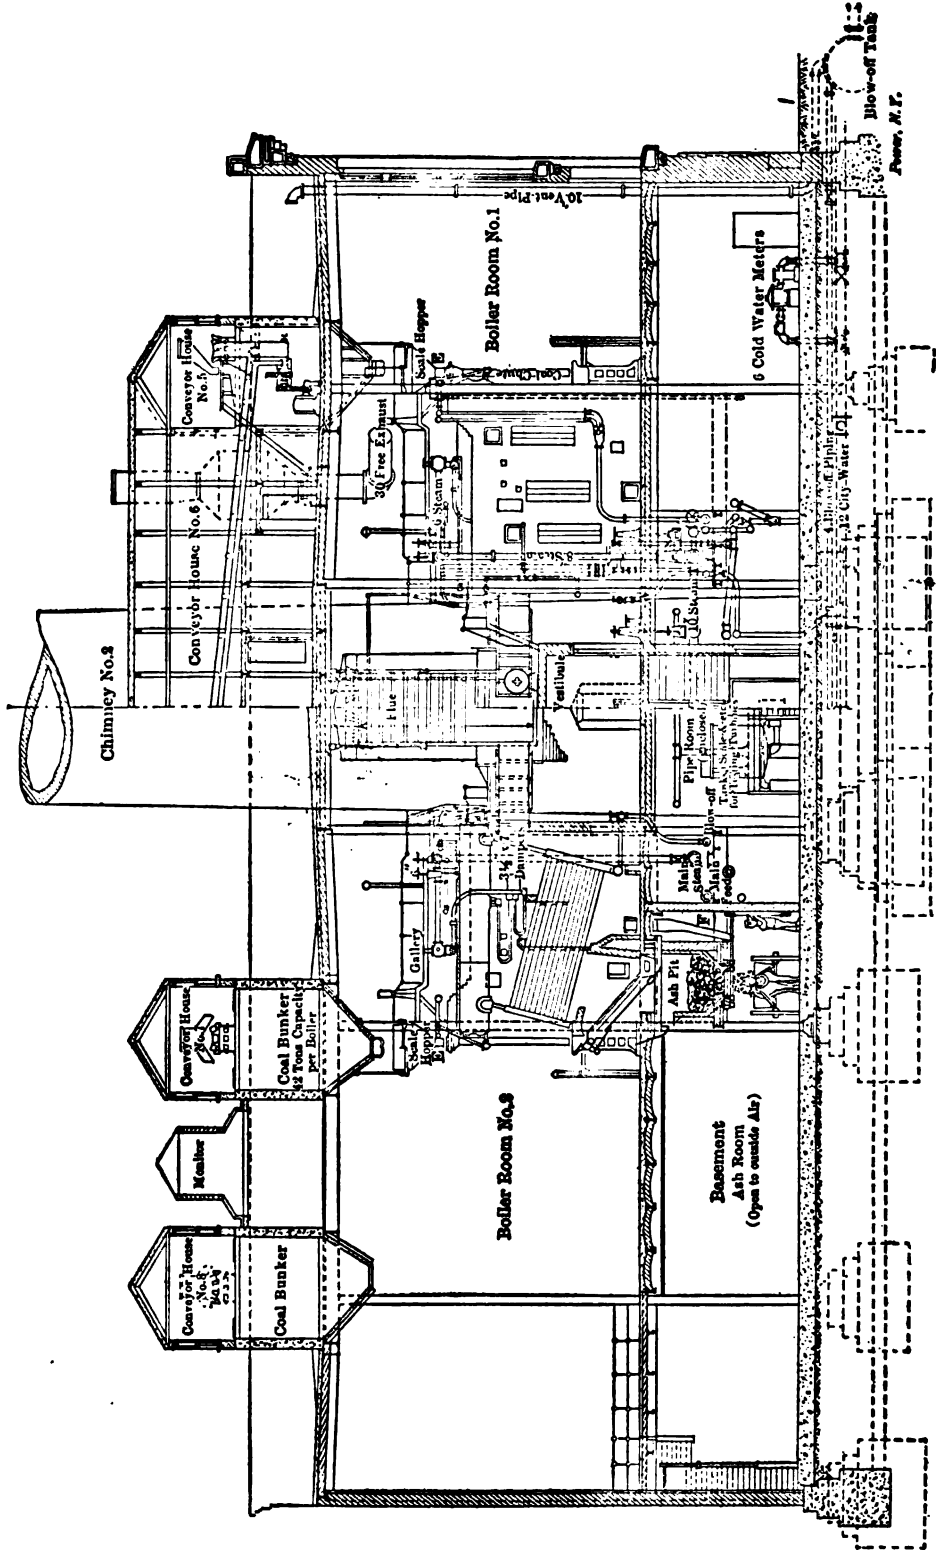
Transverse Section of Boiler House, L Street Plant, Boston.
